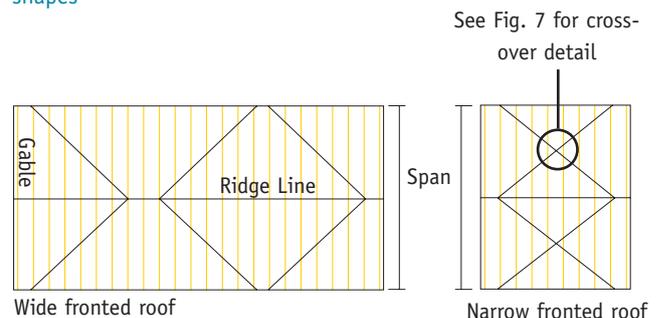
Plan of rafter diagonal bracing on differing plan shapes
